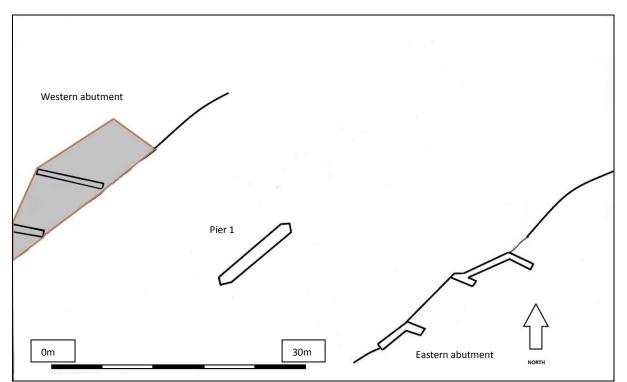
Plan of Ribton High Bridge (No. 20). Grey outline denotes area lost to river erosion.
